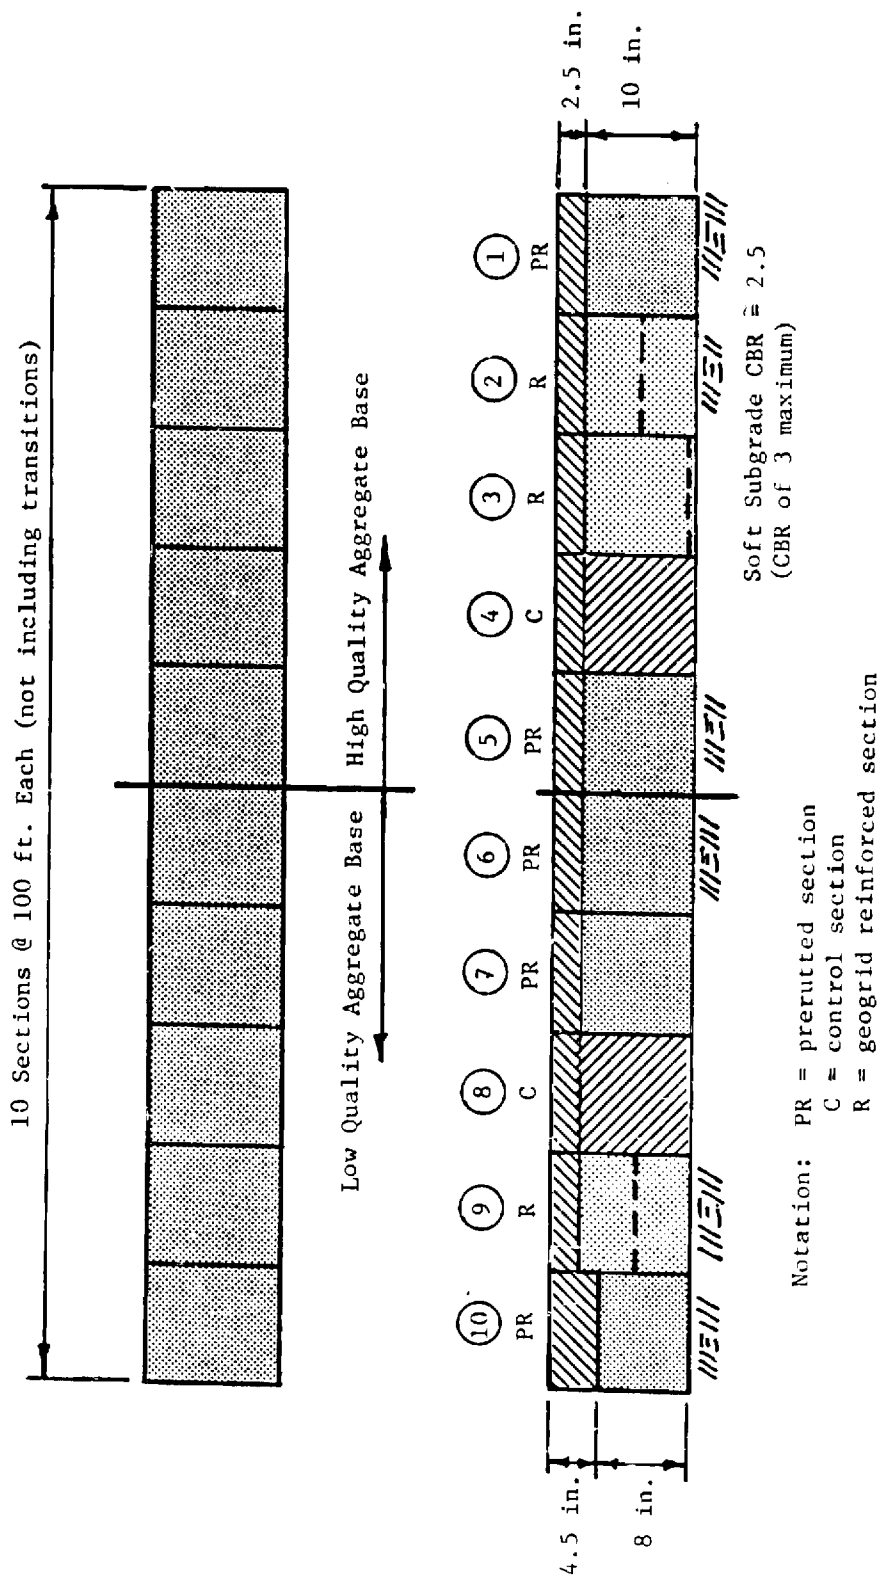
Tentative Layout of Proposed Experimental Plan.
